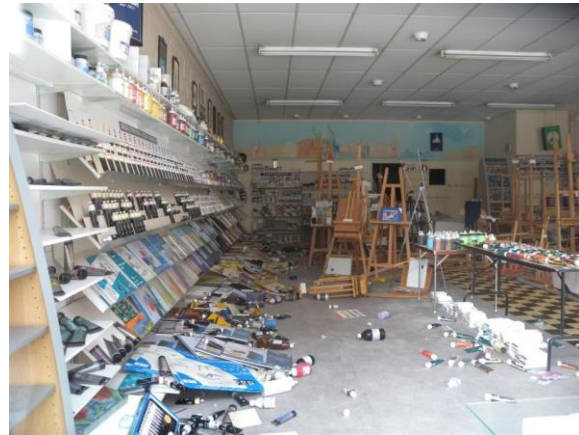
Significant nonstructural damage inside a building that is structurally stable after an earthquake event. (Photo Courtesy of Degenkolb Engineers)
